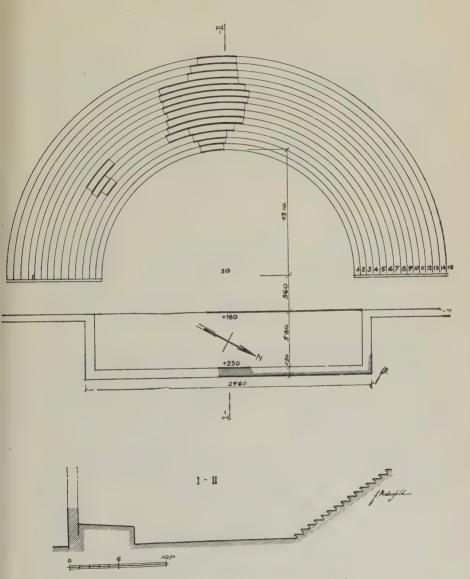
el-Hammeh. Theatre, Plan and Section.
